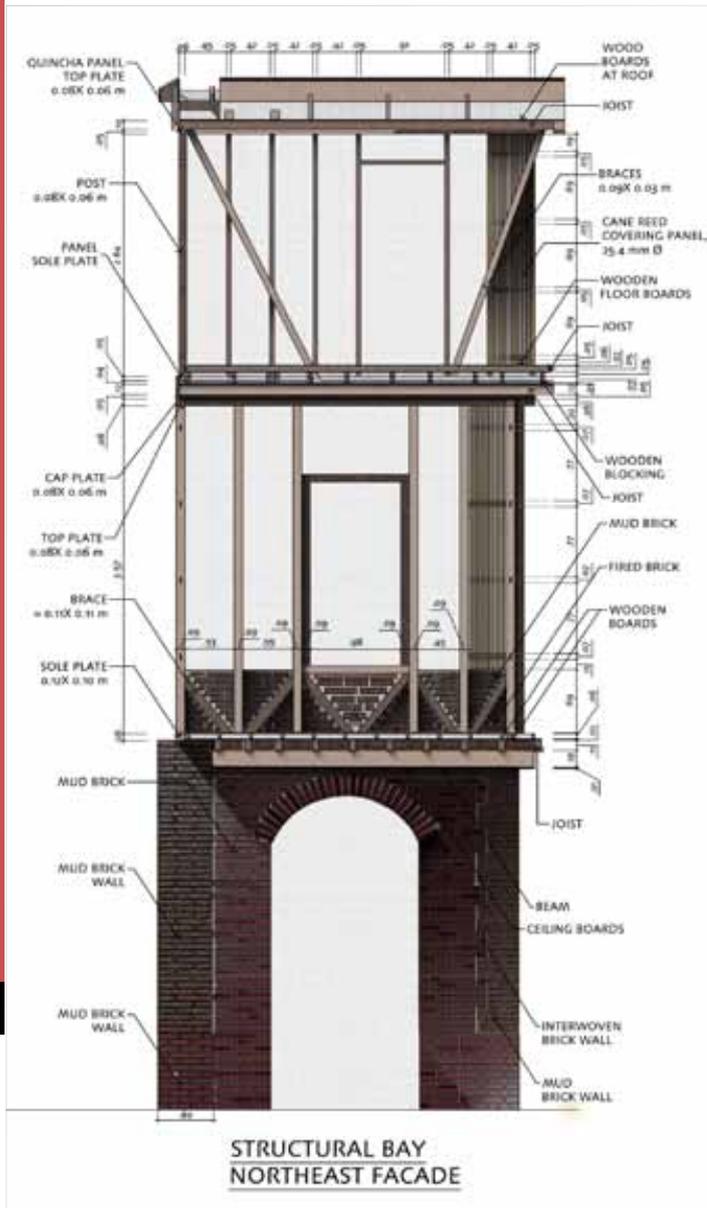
Detail drawing of the adobe and quincha interior structure of Hotel El Comercio. © Drawing: Mirna Soto, The J. Paul Getty Trust, 2011; Rendering: Jabdiel Zapata, The J. Paul Getty Trust, 2011
